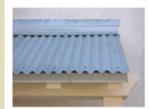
B.15 - 21/2 INCH CORRUGATED METAL ROOF
